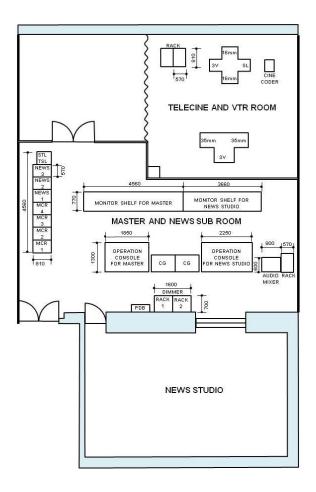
Master Control and News Sub-control Room/News Studio/Telecine Room
